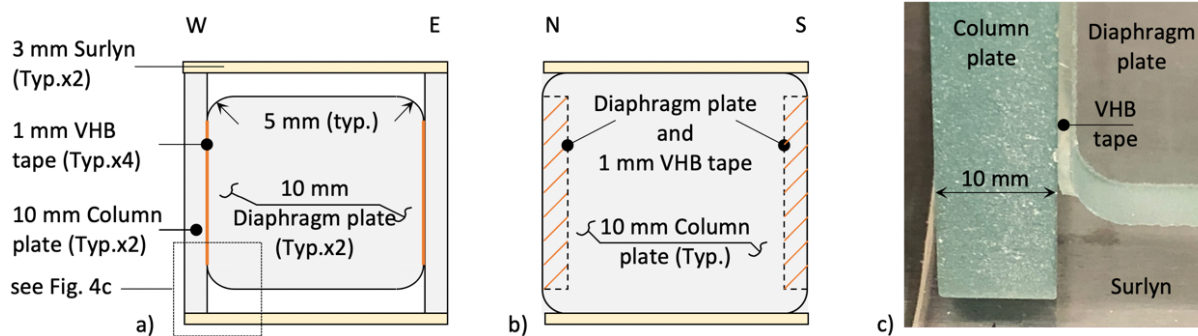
Sample details. a) E-W view, b) N-S view, c) Exploded view of connection
